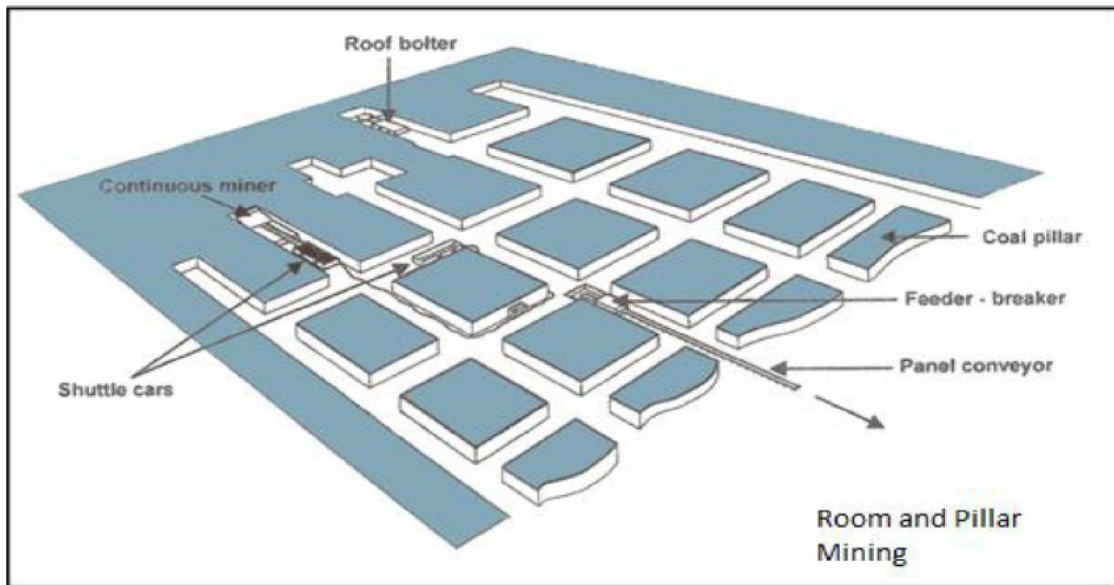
Layout of a room and pillar mine after Altounyan (1999)
